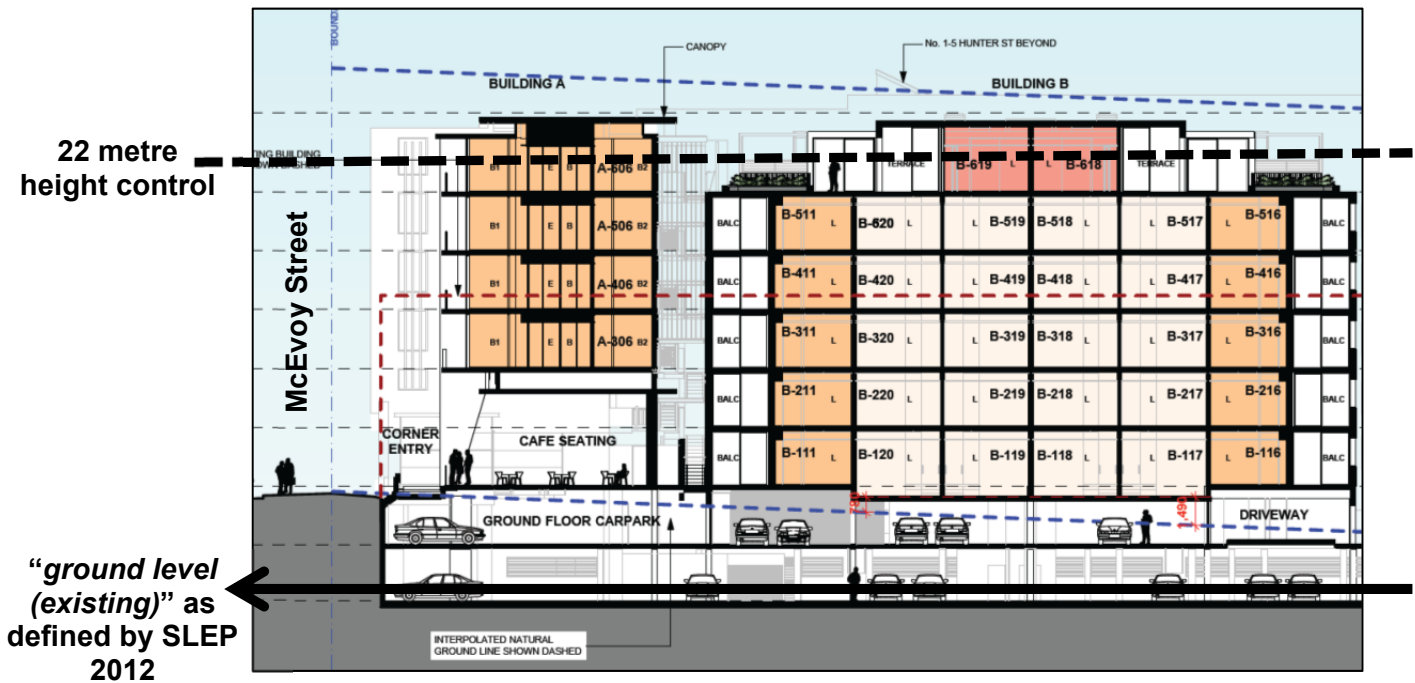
North-South section of Buildings A and B illustrating the location of existing ground level on site and the technical breach to the building height development standard
